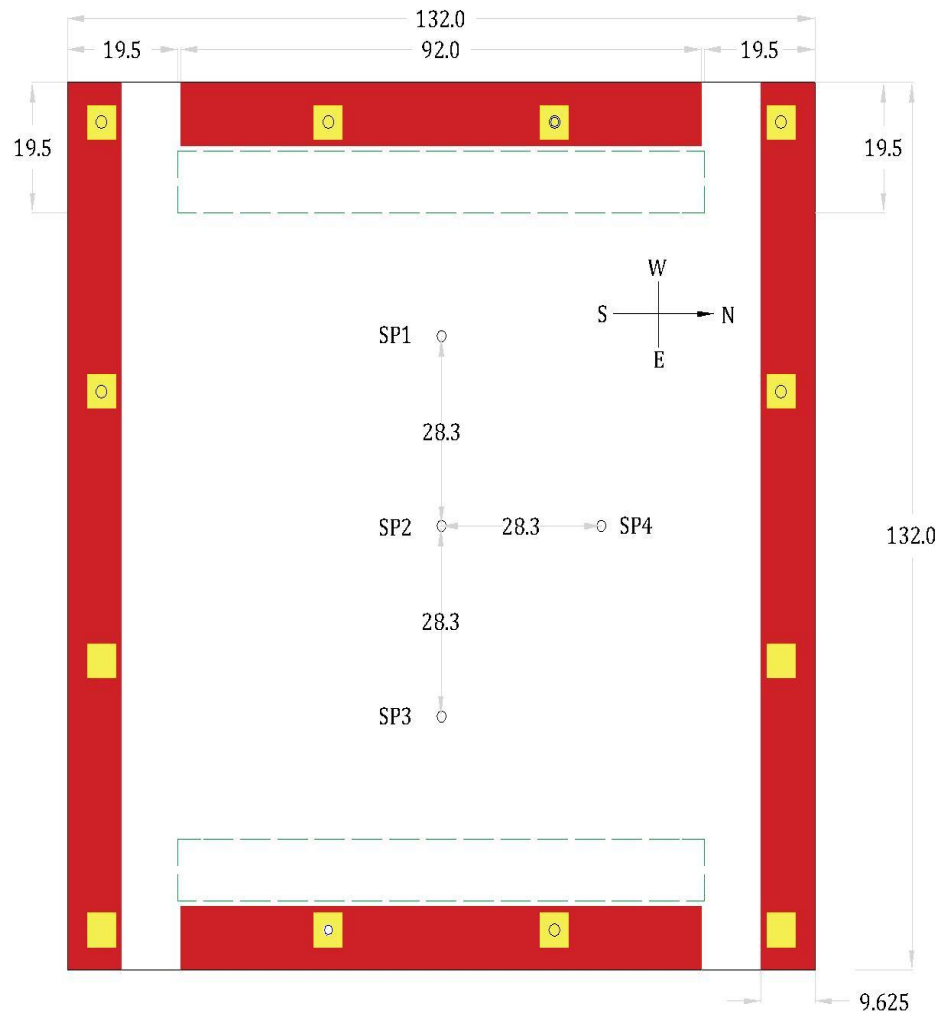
Locations of String Pots for Sandwich Slab Specimen A
